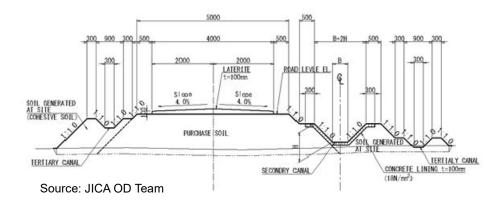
Typical Cross Section of Secondary and Tertiary Canal
